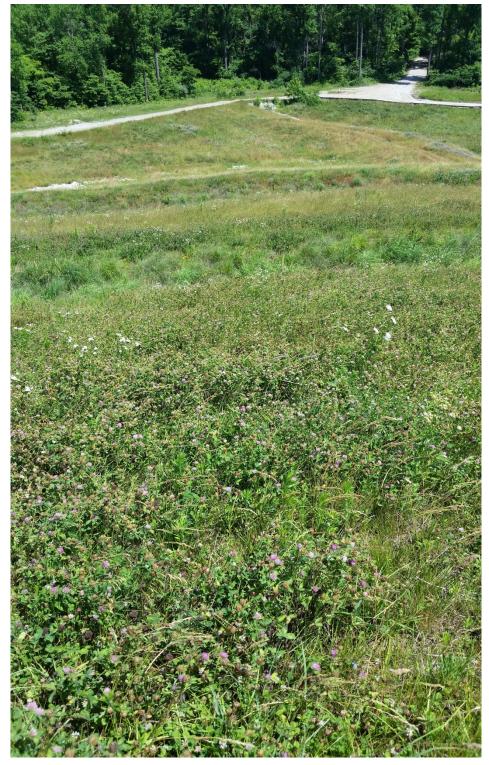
EV3 East Plant Area Cover facing North toward ES9 (Detention Basins 1 and 2) and ES6.
